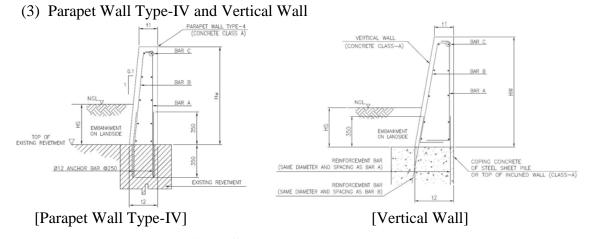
Typical Cross Section of Parapet Wall Type-IV and Vertical Wall
